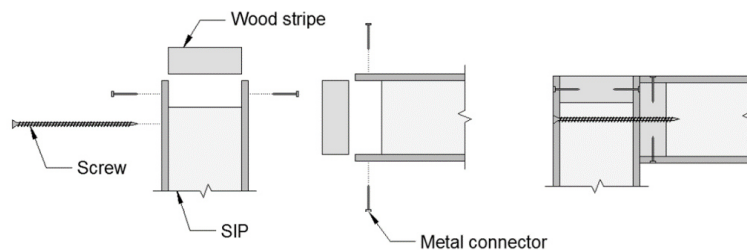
Corner wall connection with screws and wood stripes between SIPs.
